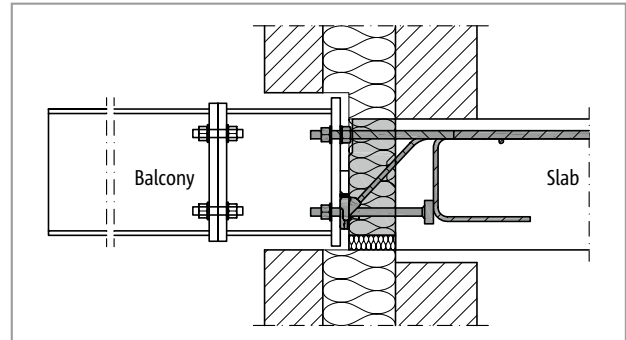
Schöck Isokorb® T type SK: Connecting the cantilever fin with stub bracket; Isokorb® insulating element with optional additional insulating strip
